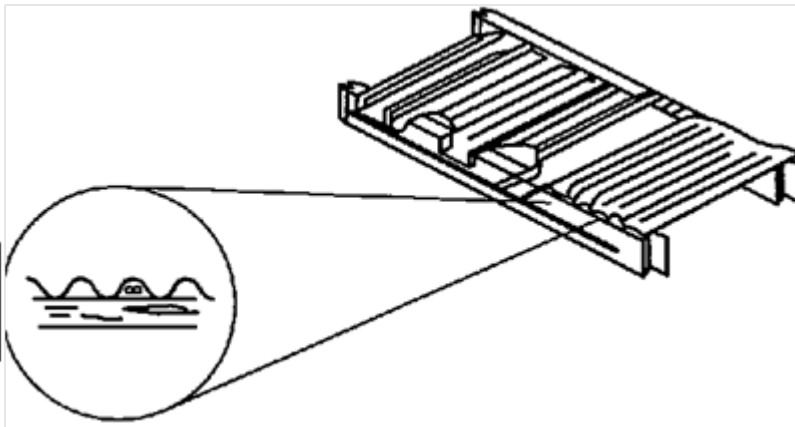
PROHIBITED CABLE LOCATION-ROOF OR WALL-LINING MATERIALS
